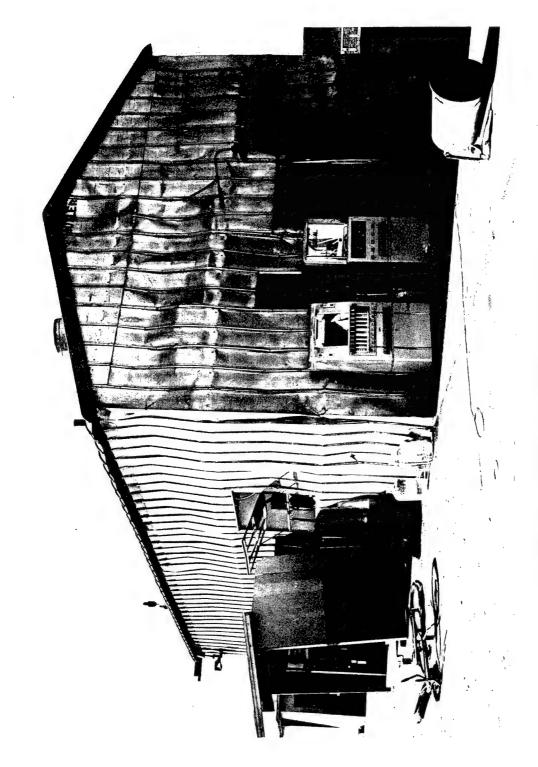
DAMAGE TO BUTLER BUILDING, TS-1
